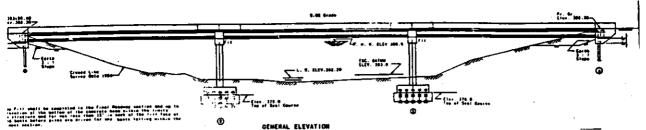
Bridge General Elevation (New Wahite Ditch Bridge)
